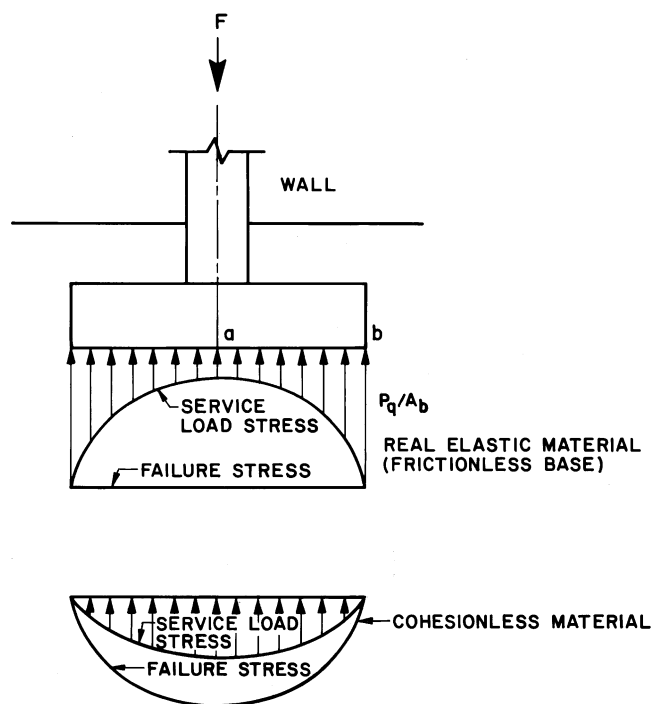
Soil structure interaction for a strip footing.
